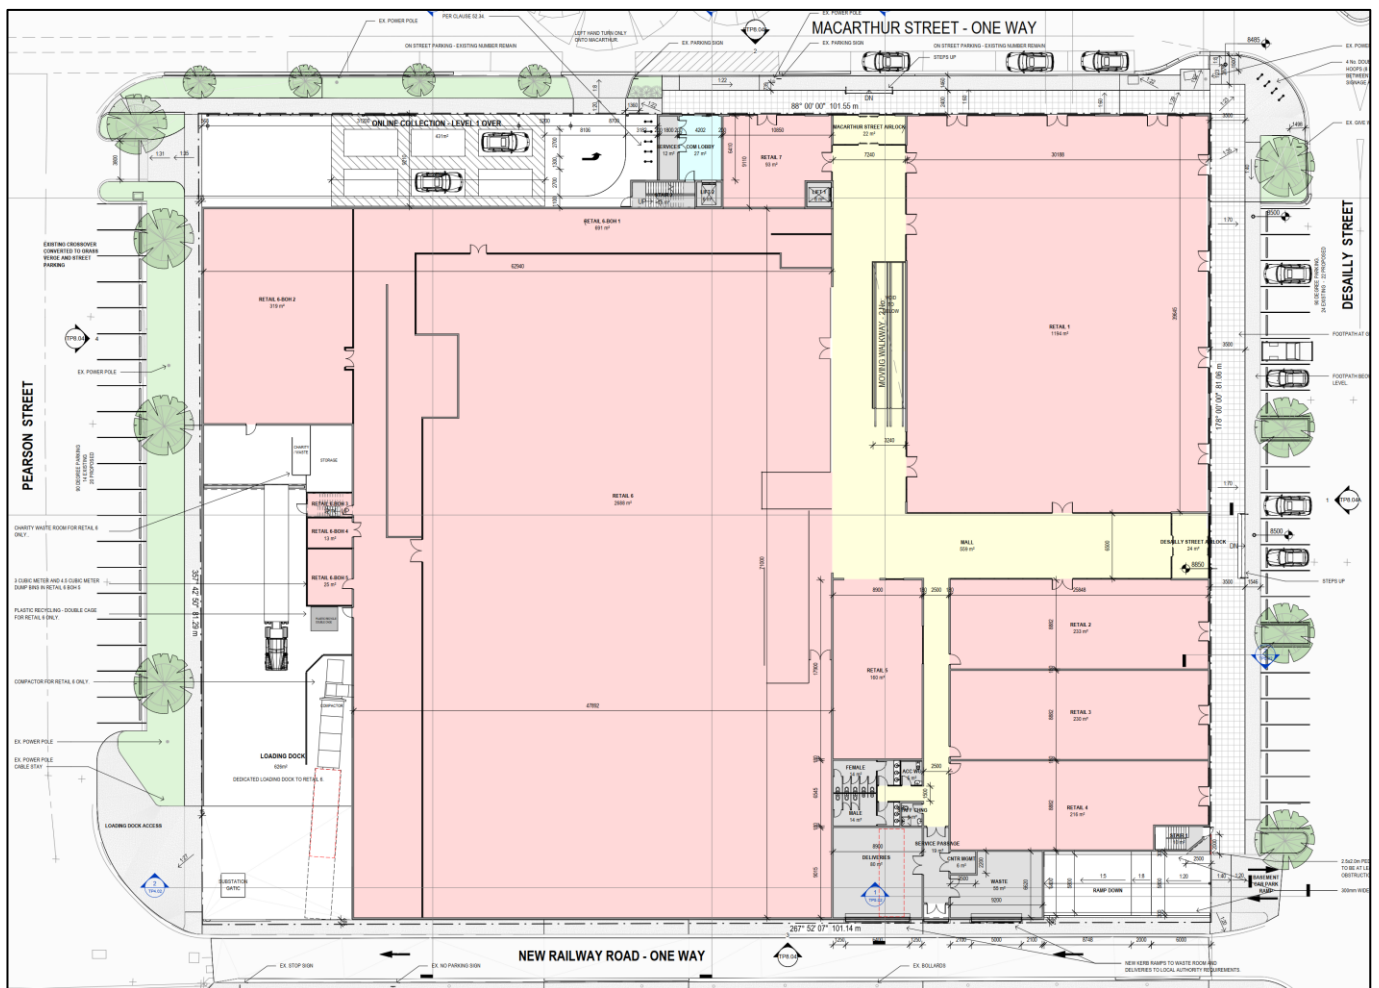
Ground Floor - Development Plan excerpt (Source: ThextonSmith)
